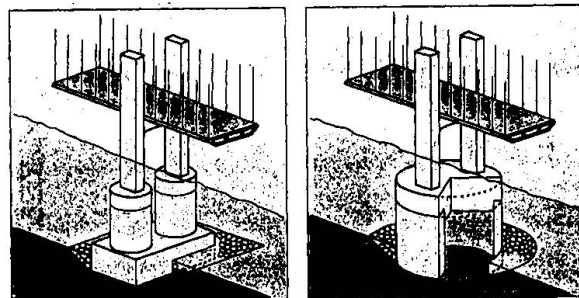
Twin-shaft type foundation (left) and cylindrical solid foundation (right)
